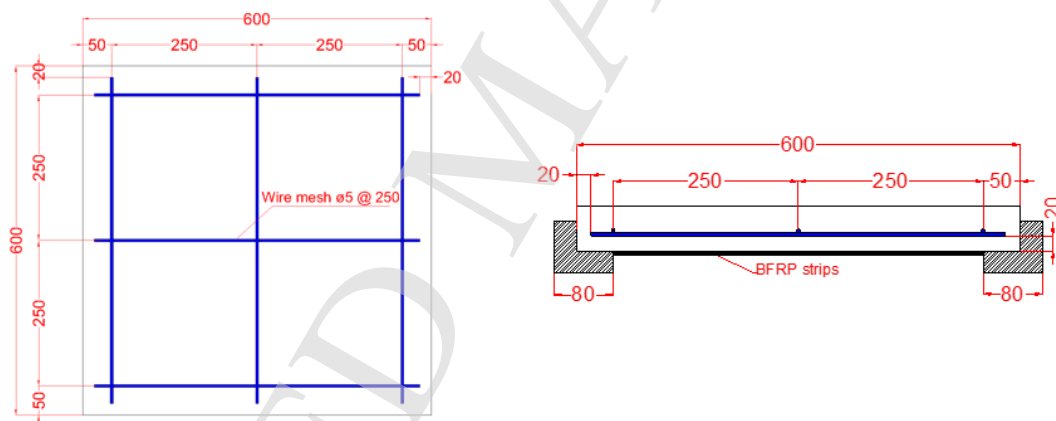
Dimension and reinforcement configuration of RC slab (Unit: mm) (L) Plan view; (R) Elevation view;
